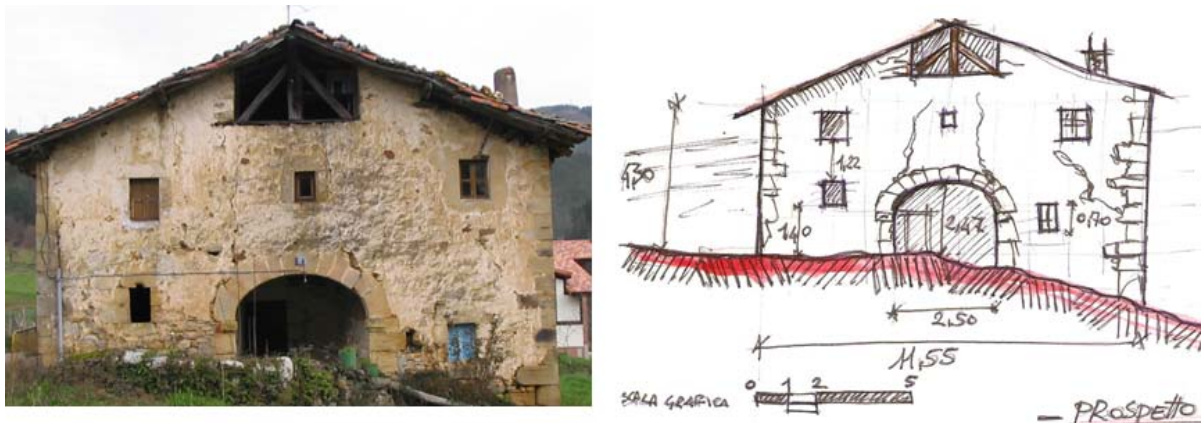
Front view and dimensioned sketch – caserio Oar Azpikoa
